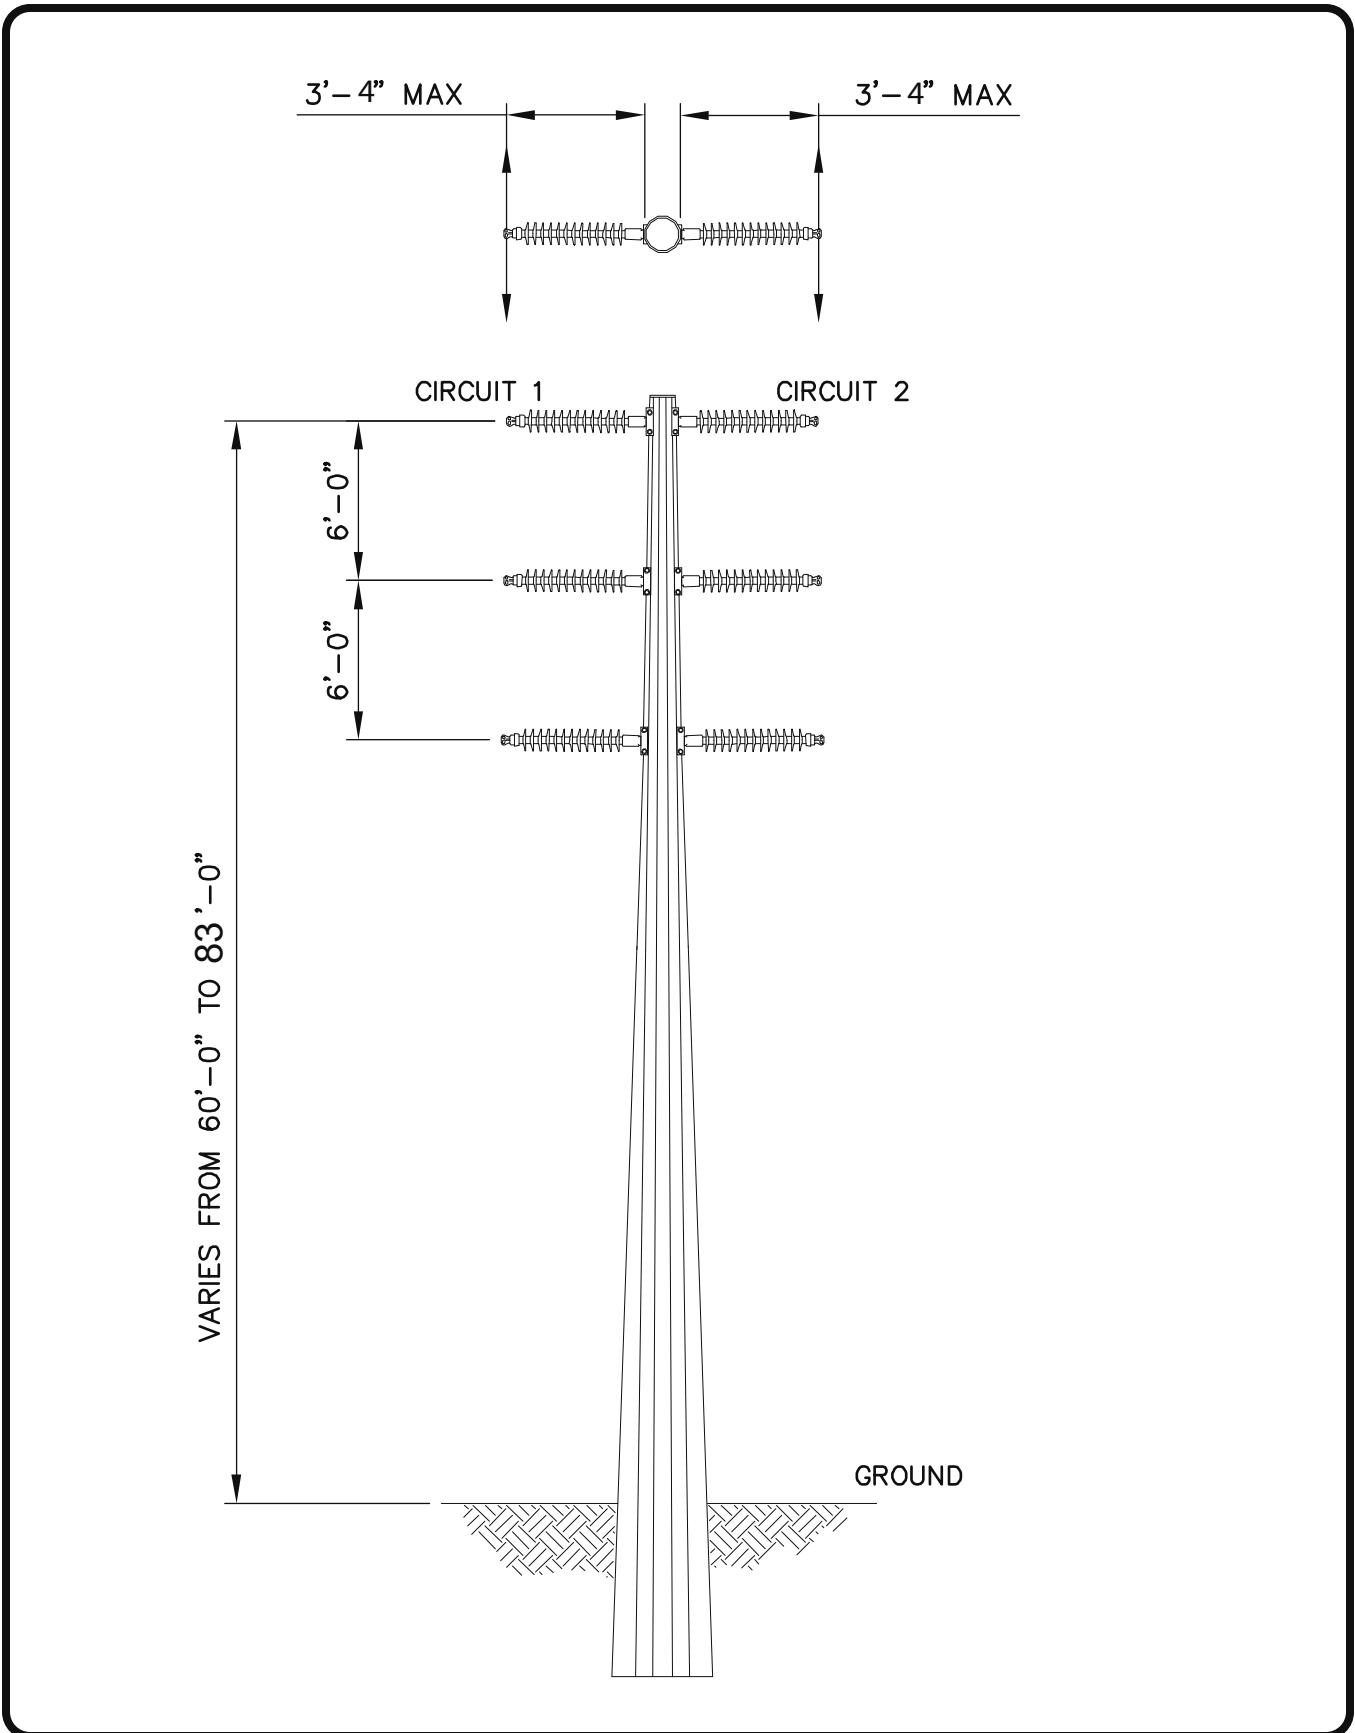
Proposed 69 kV Steel Pole Typical Drawing
